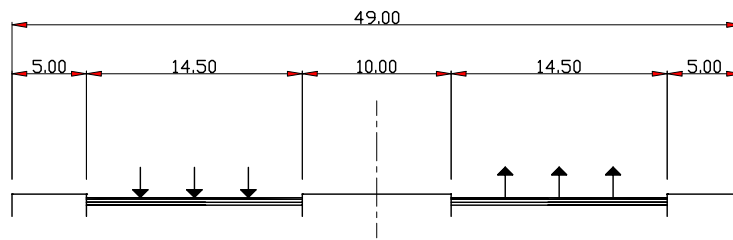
Typical Cross Section on Rodovia BR-316
